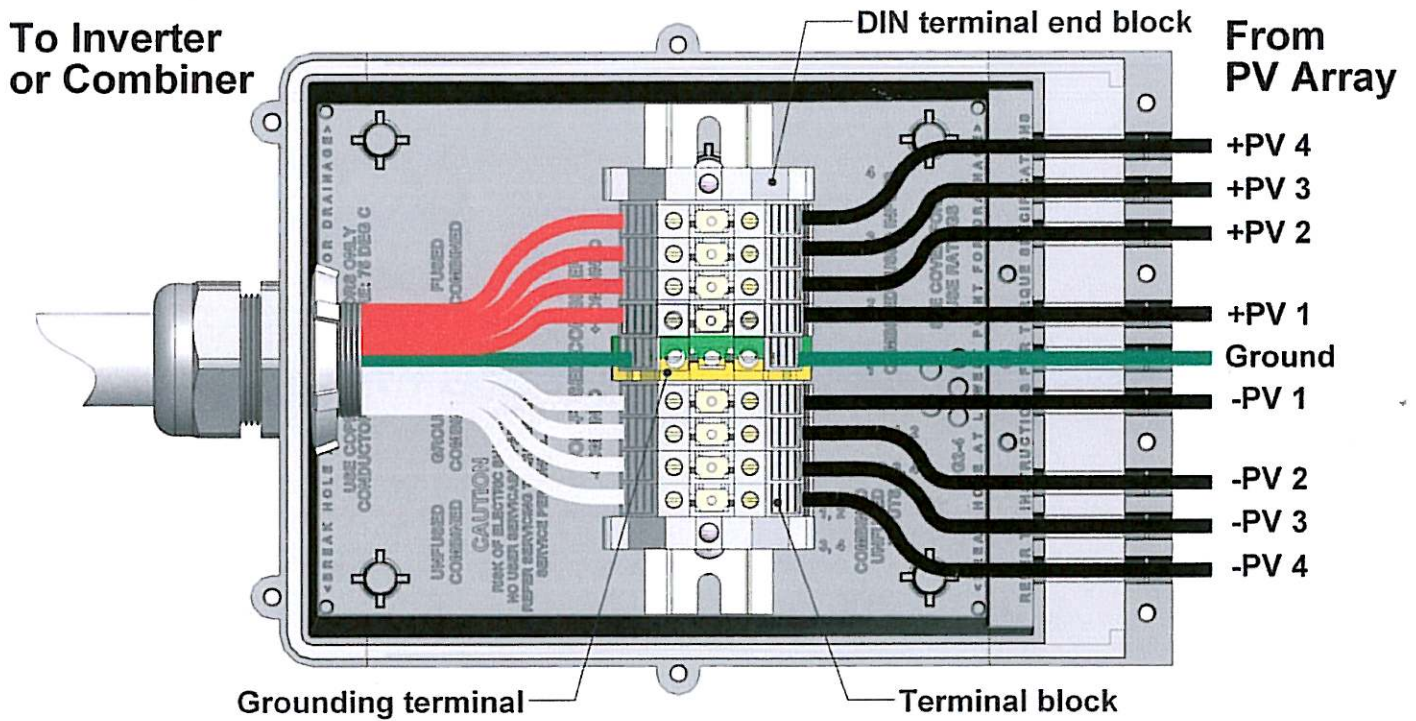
Wiring Layout – Pass-Through with DIN Rail-Mount Terminals
